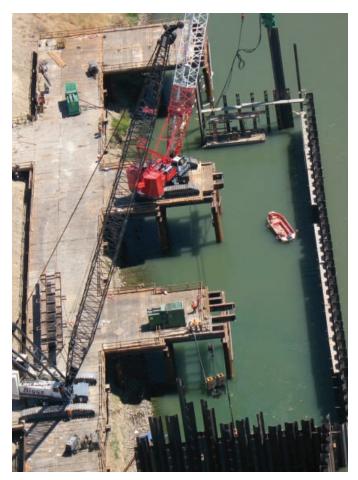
The project incorporated cofferdams constructed of hot-rolled steel sheet piling combi-walls.
